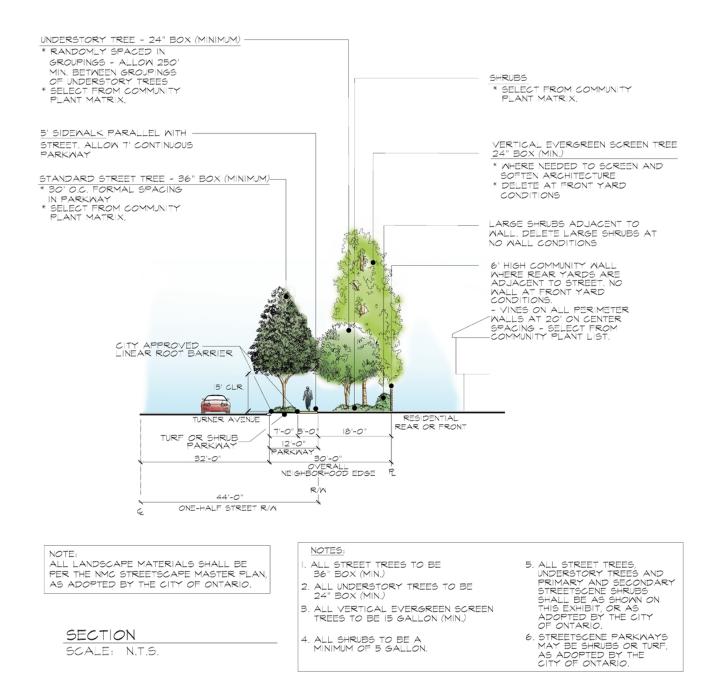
TURNER AVENUE STREETSCENE AT RESIDENTIAL (EAST SIDE)
